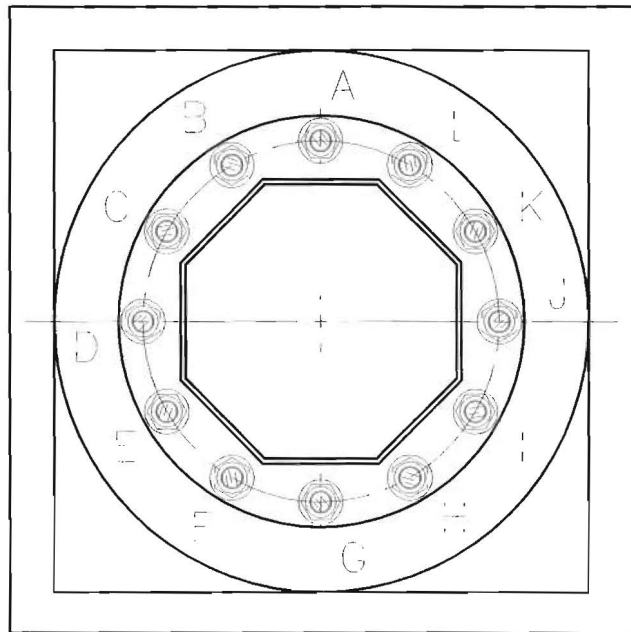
Anchor bolt locations for HMIP 4 1/2UNC laboratory specimen.
